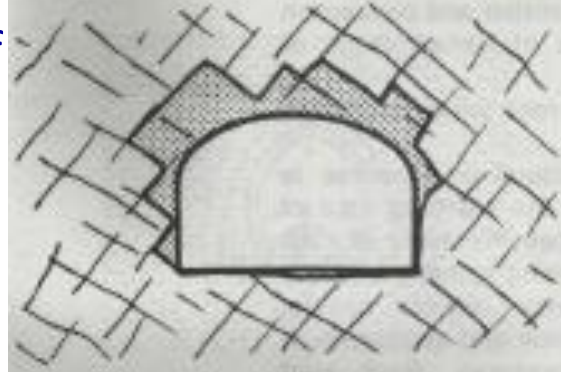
Faults intersecting the tunnel excavation face in RMR Class IV shales.
